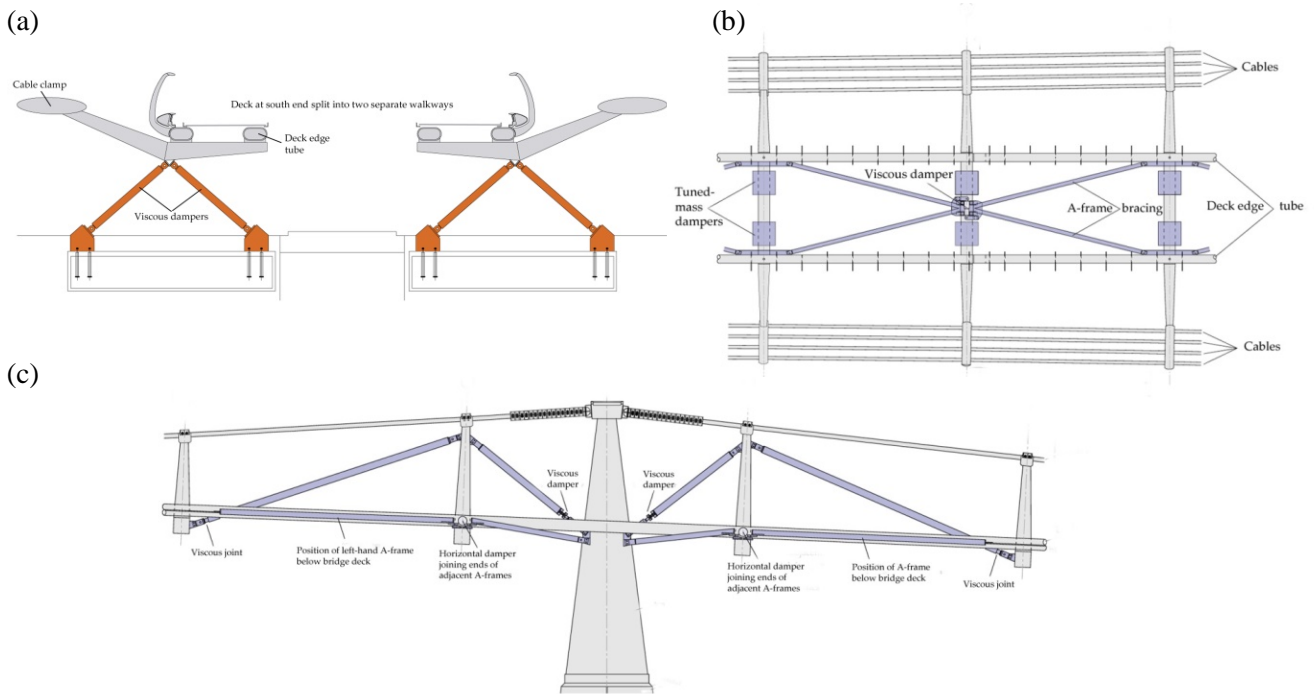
the viscous damper arrangement, showing (a) the ‘vertical dampers’ connected to the south bank, (b) the A-frame arrangement connecting the horizontal ‘deck dampers’ and (c) a side elevation showing two pairs of ‘pier damper’. Based on similar figures in Dallard et al. [3, 4].
